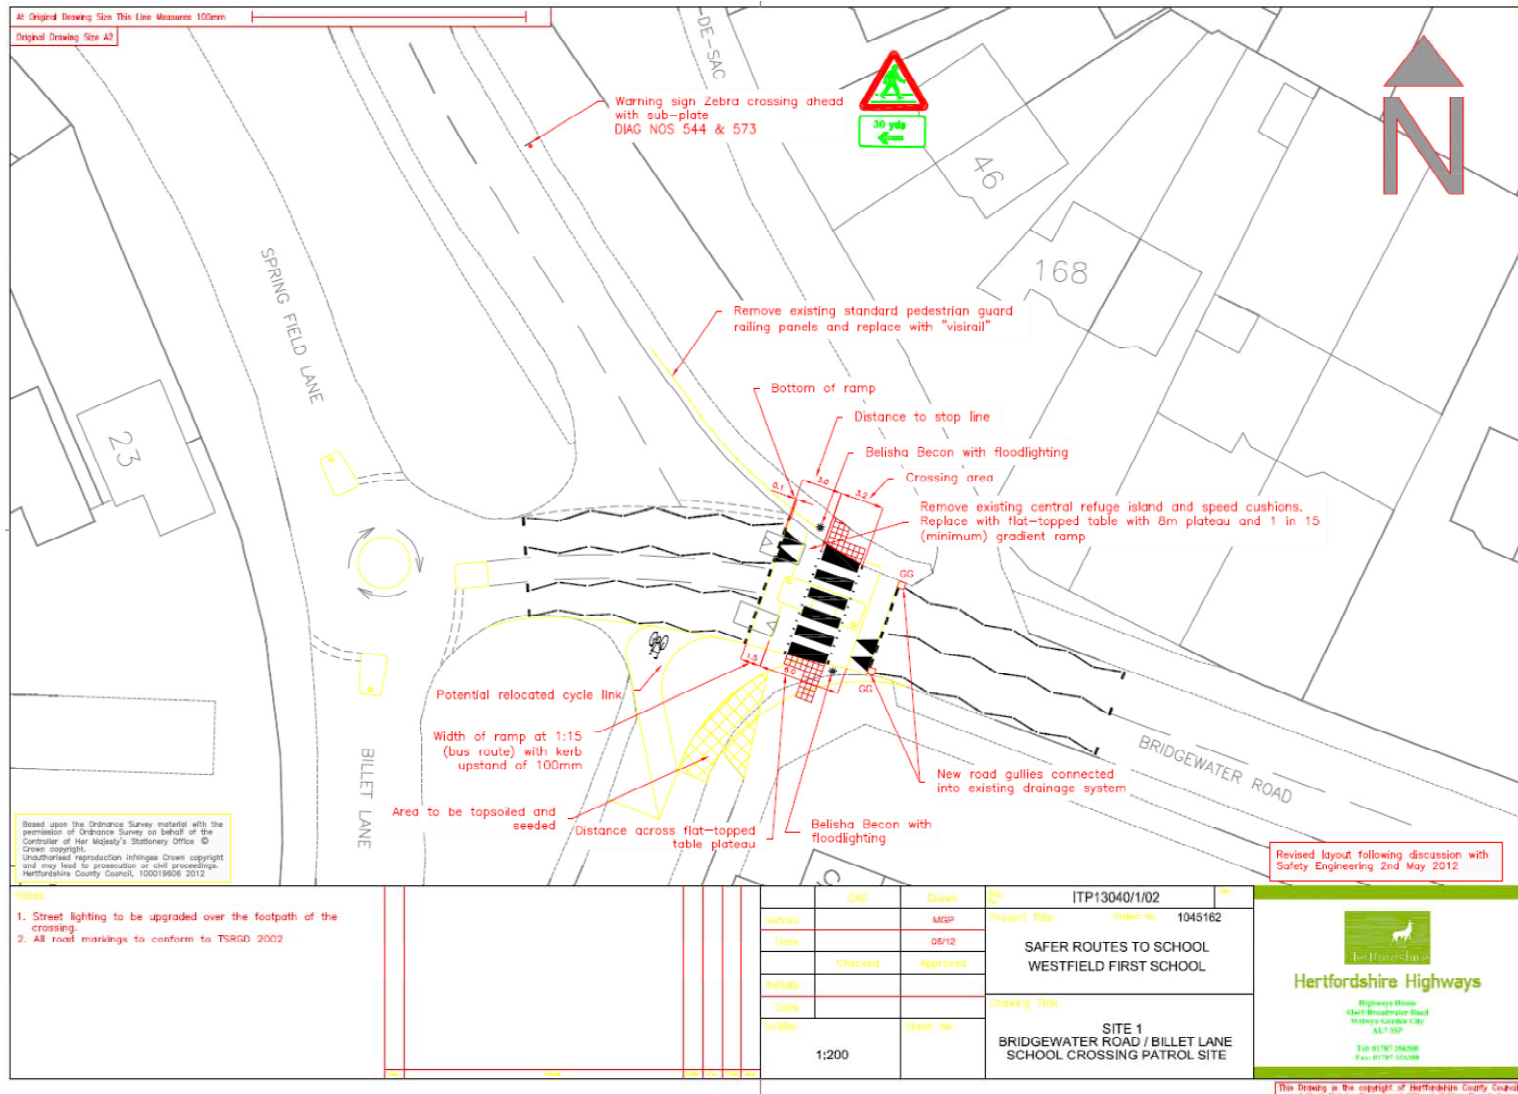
Formal Crossing at Bridgewater Road / Billet Lane
